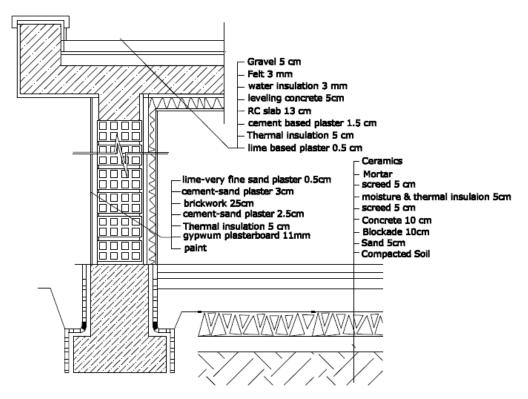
Construction Technique in Contemporary period- Brick wall $-C_{14}$
